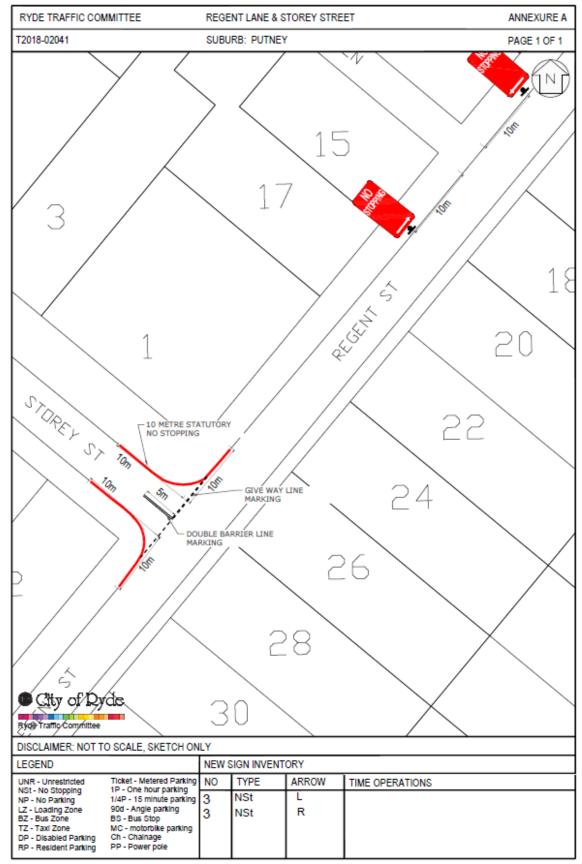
Proposed No Stopping on Regent Ln and Storey St
